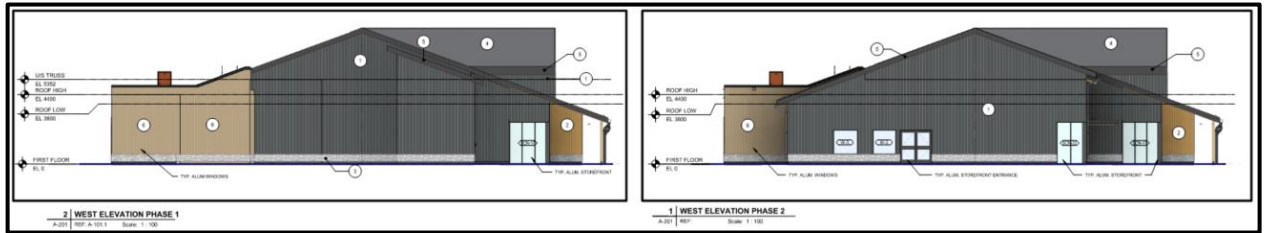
West elevation conceptual rendering at the completion of Phase 1 (left) and Phase 2 (right)
